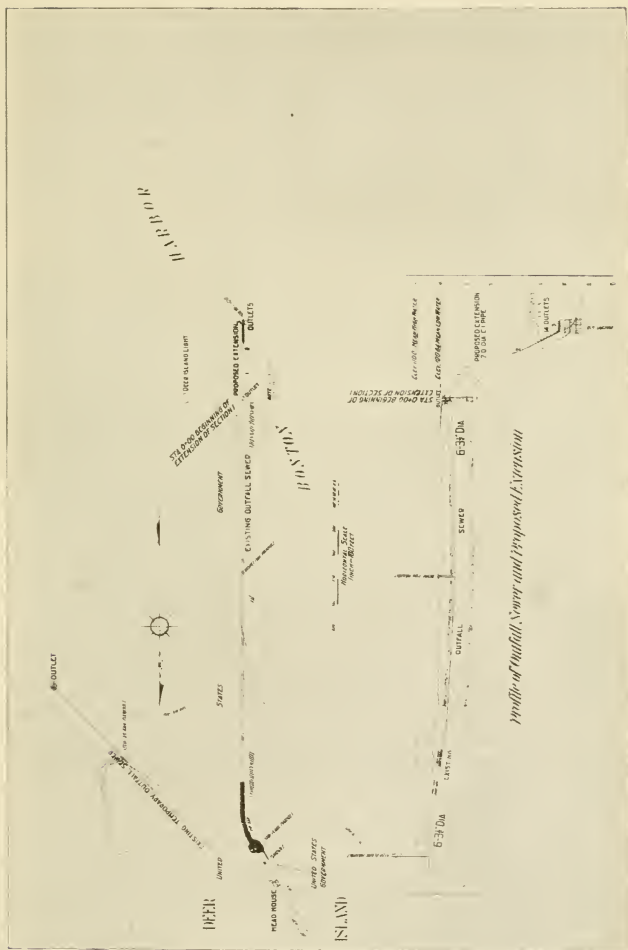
EXISTING, TEMPORARY AND PROPOSED SEWER OUTFALLS AT DEER ISLAND.
